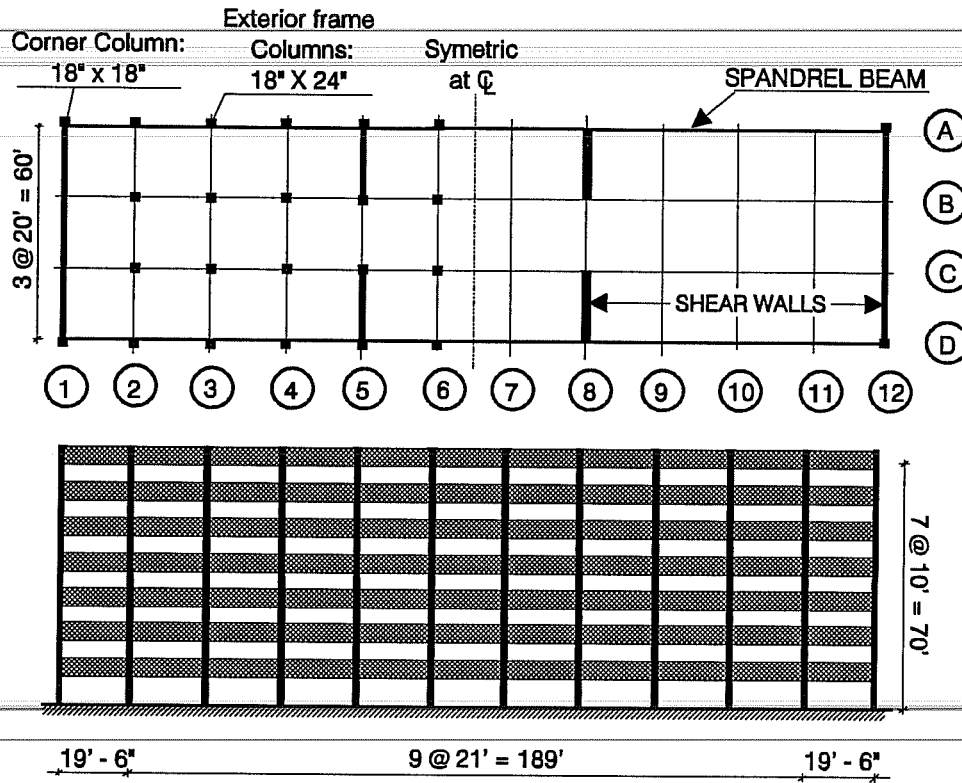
Elevation and Plan Views of the Seven-Story Building
